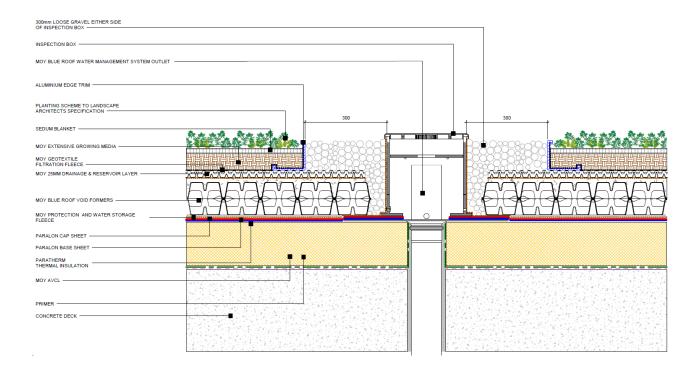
Blue-Green roof rainwater outlet and inspection box
